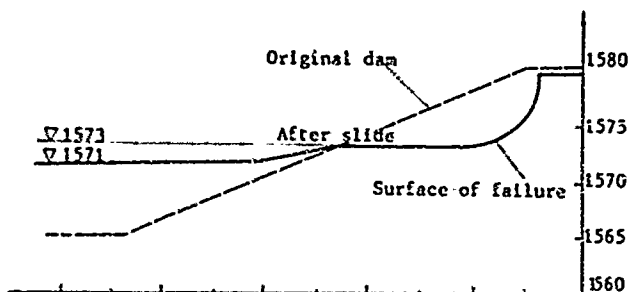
Cross section of slide on the upstream slope of Kashi earth dam at 0+250 after earthquakes
